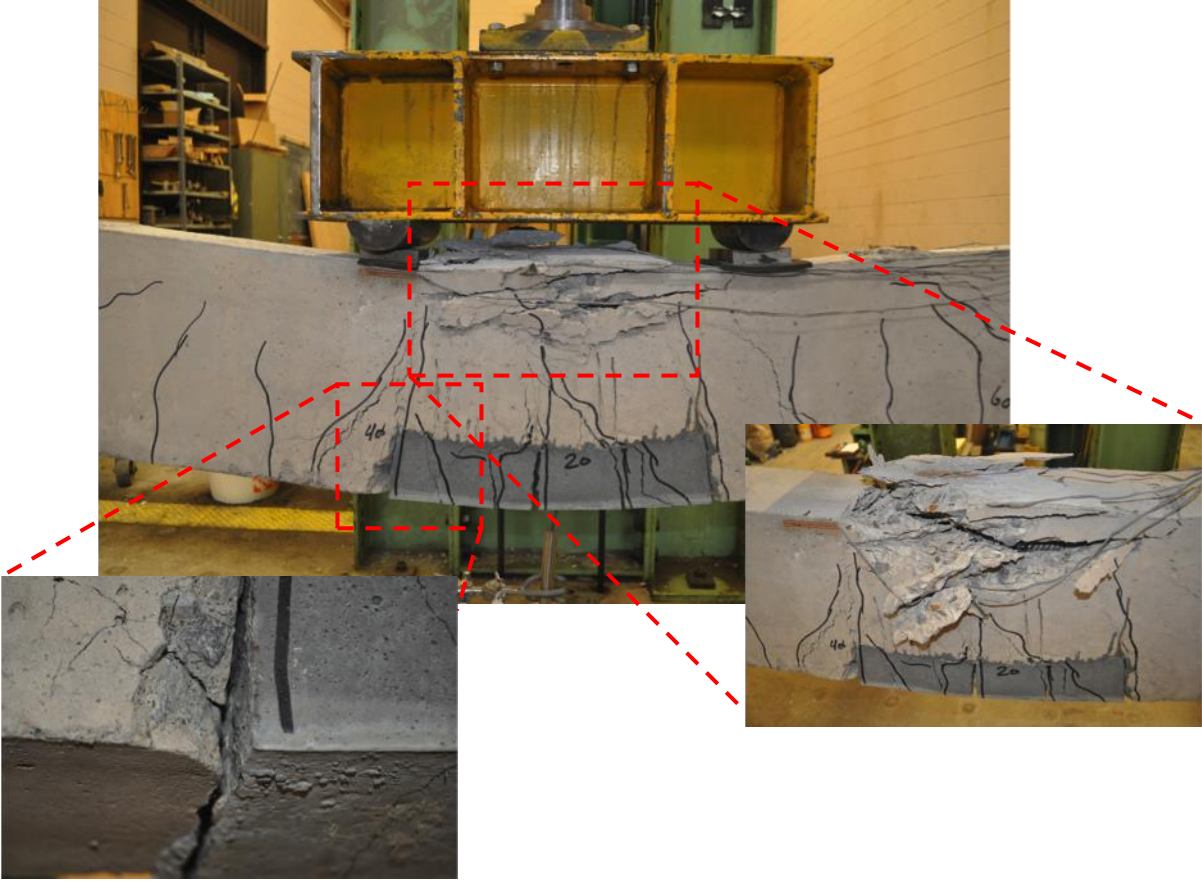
Failure mode for the bottom-patch repaired beam with Sikacrete-08SCC
